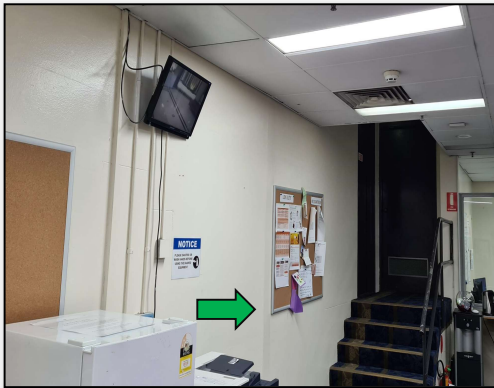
Level 5, internal, office walls - Non-lead containing cream coloured paint system.
